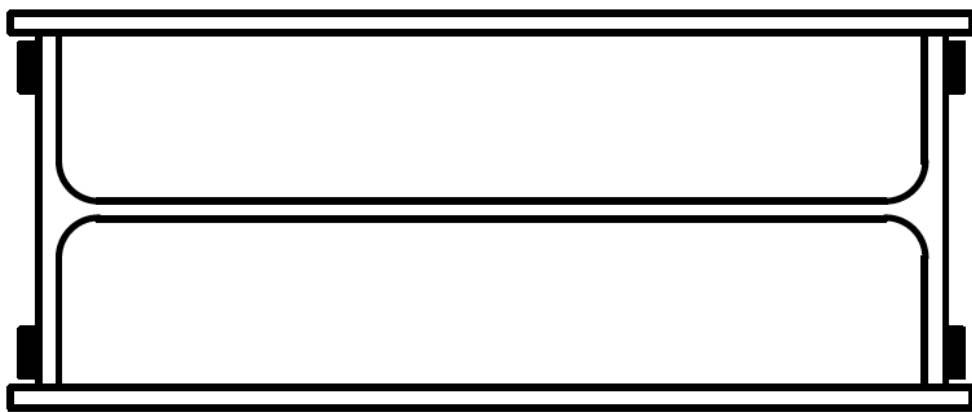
Section View of Ring Beam Strain Gage Locations
